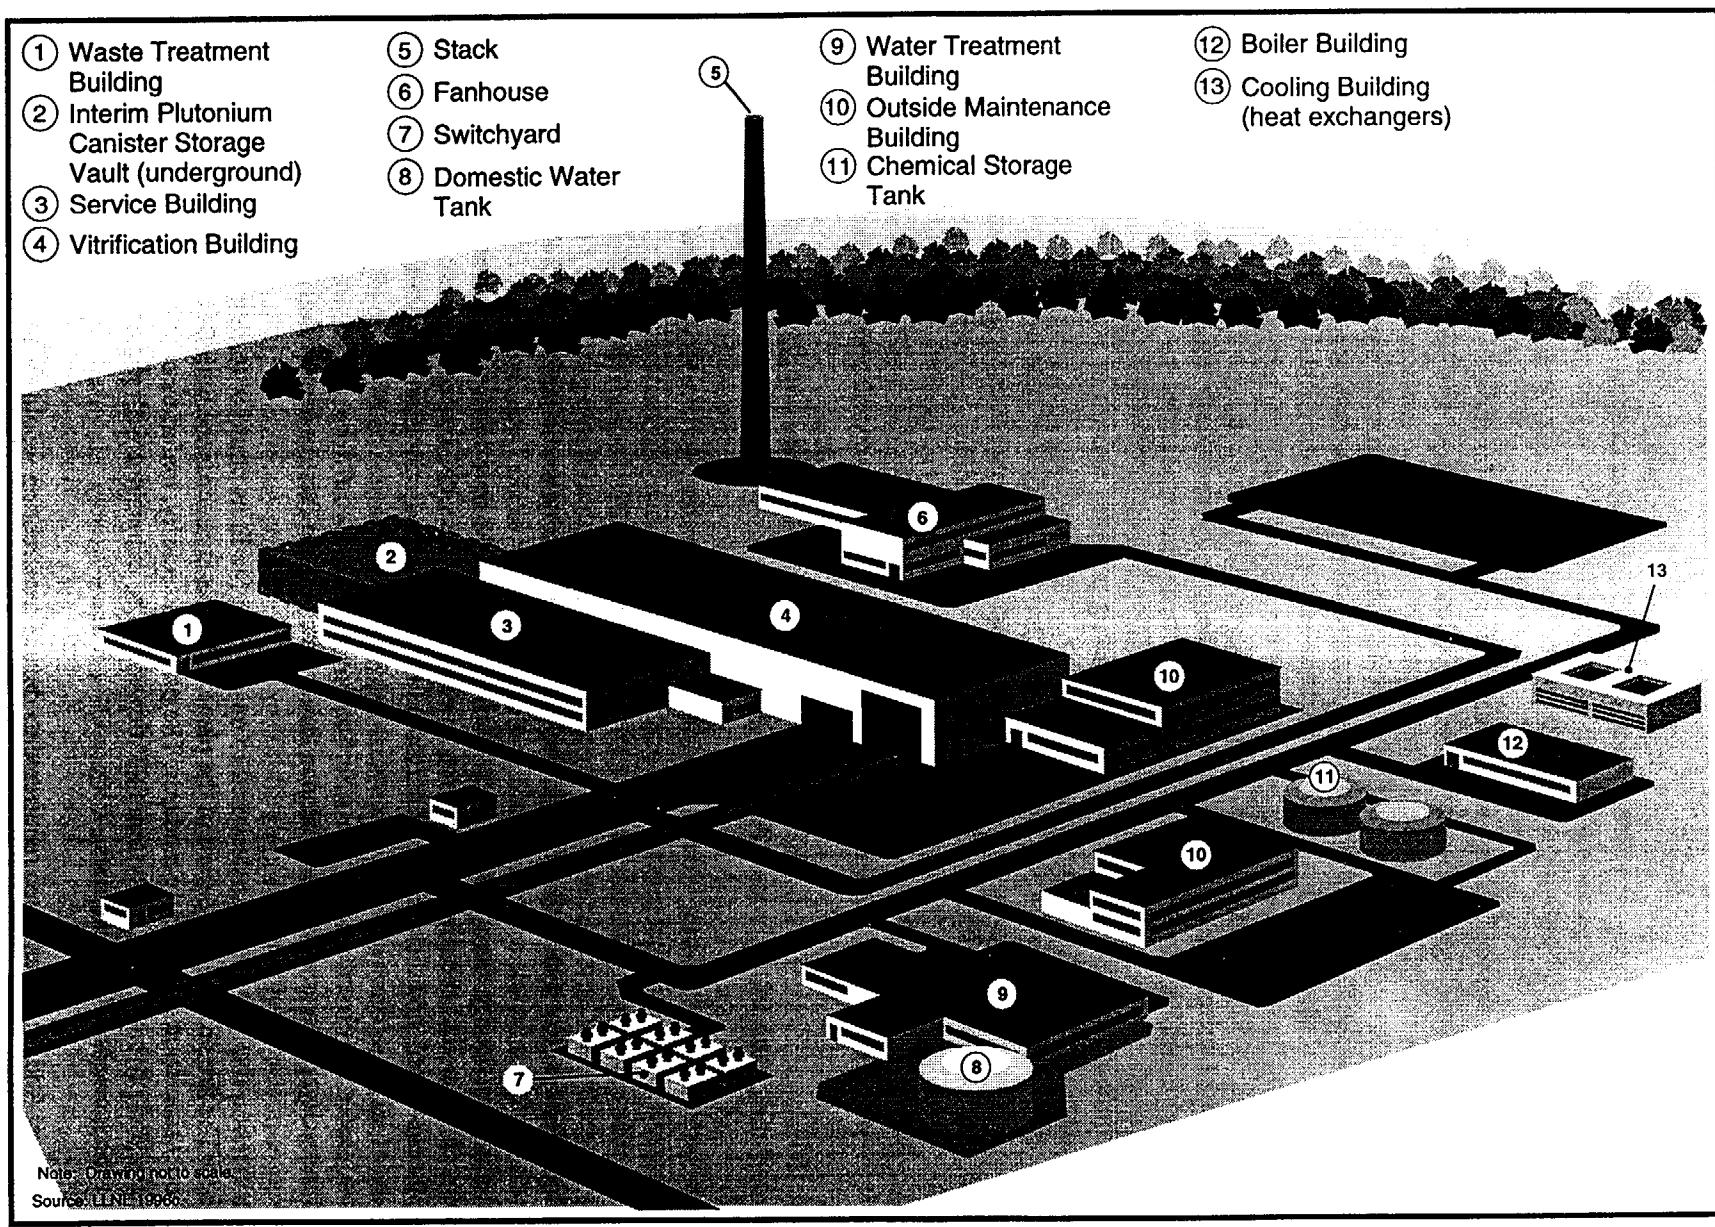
Conceptual Vitrification Facility Site Layout (Perspective).
